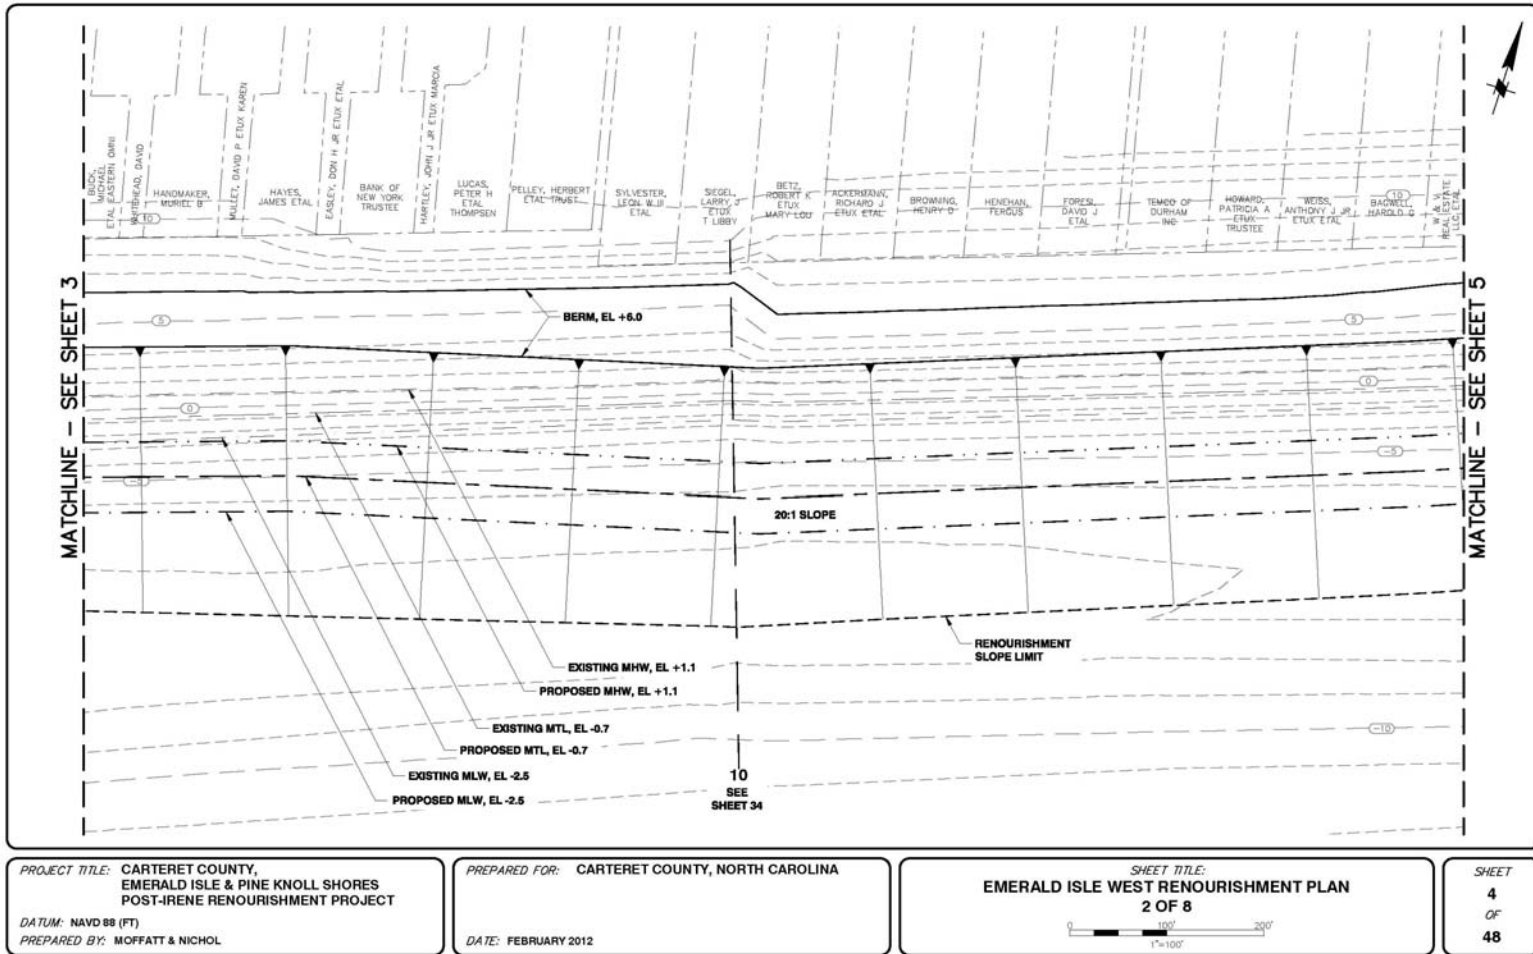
Emerald Isle West Renourishment Plan (Typical)
